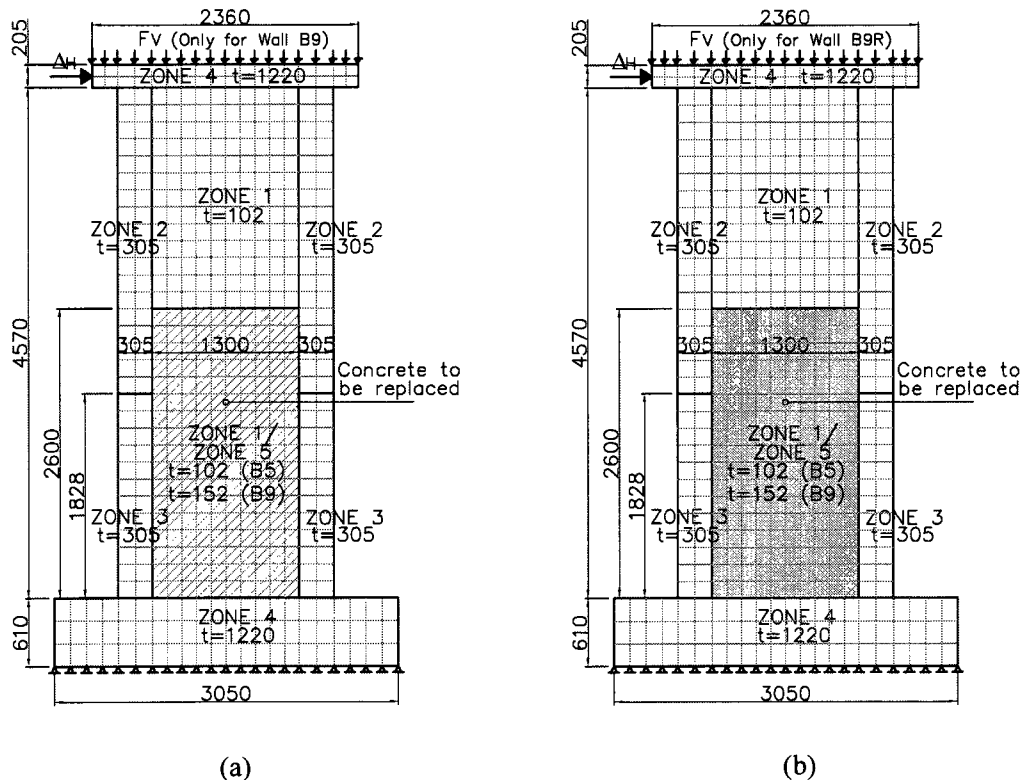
Finite Element Mesh of Walls: (a) B5 and B9; (b) B5R and B9R. All Dimensions in mm
